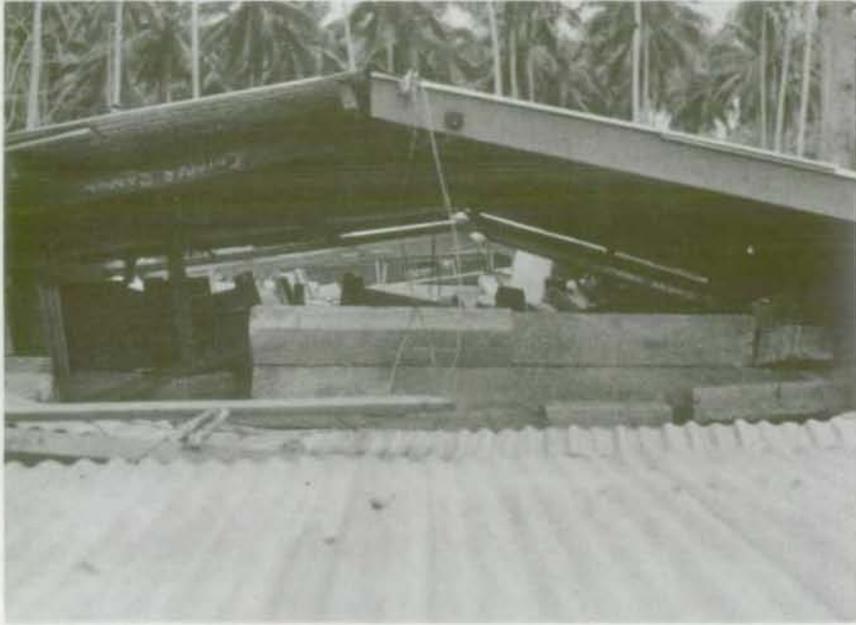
Complete collapse of same type of concrete structure seen in Plate 11.
